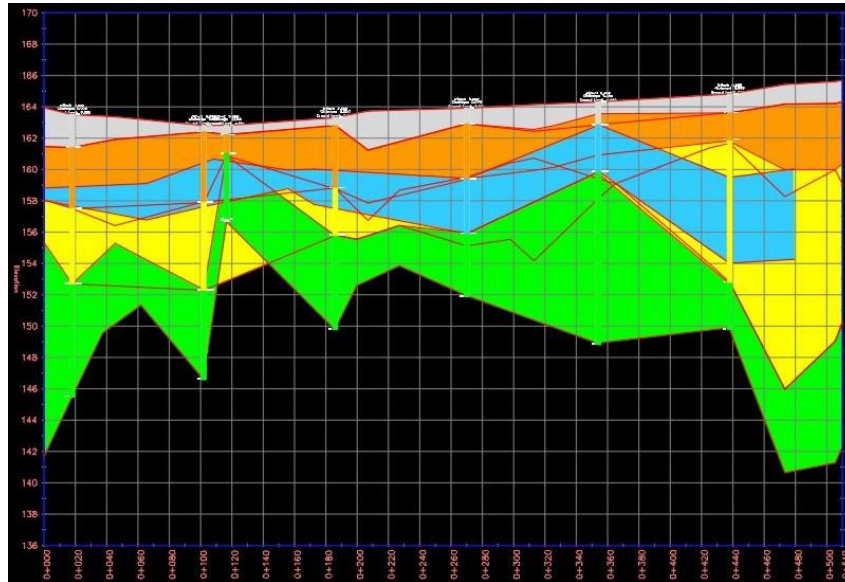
Section 1-1 – Subsoil profile below Main Process Plant foundation
